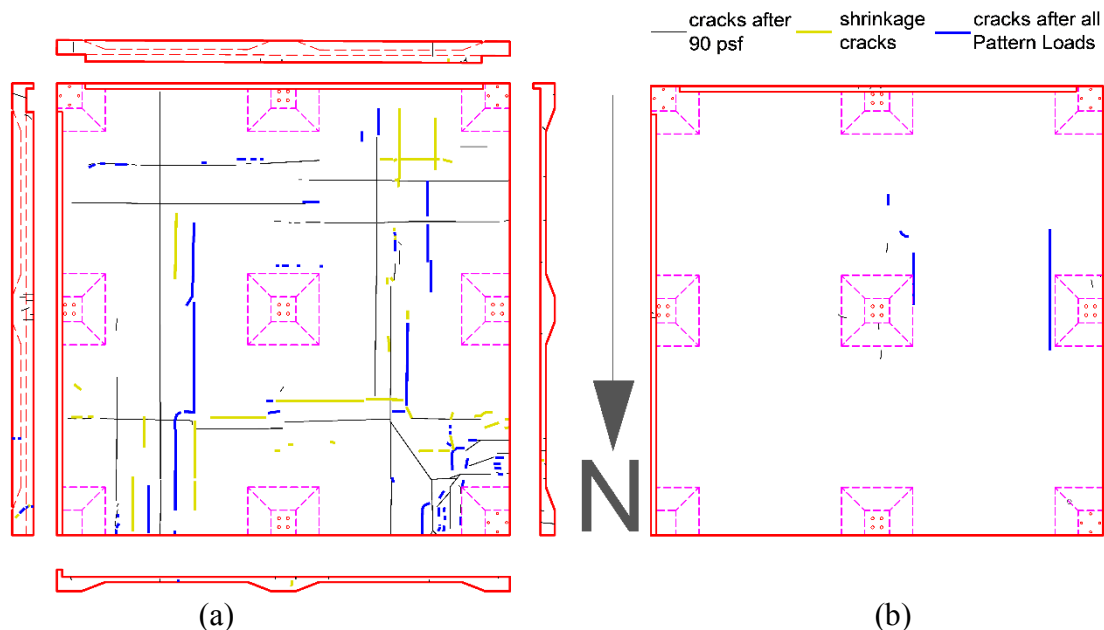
Observed cracks on the specimen at the end of pattern load tests, (a) bottom surface, and (b) top surface of specimen.
